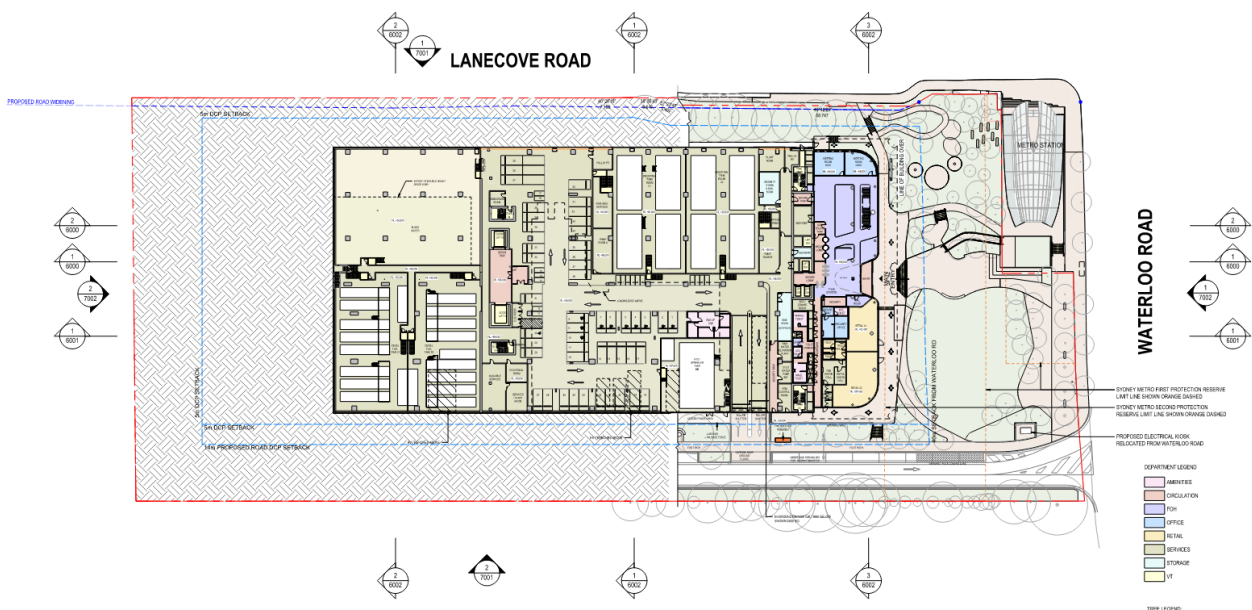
Preliminary ground floor plan for the proposed development. Source: HDR Architecture (26/08/2025)
